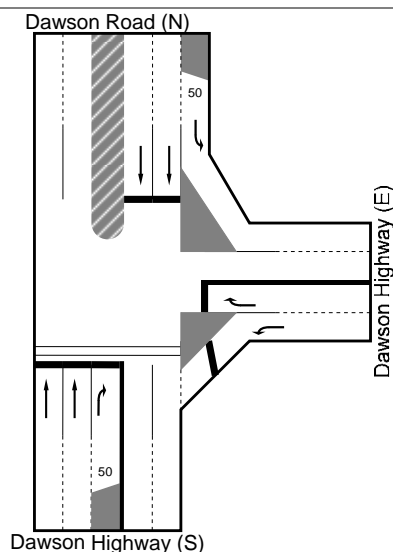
Existing Dawson Highway/Dawson Road/Breslin Street intersection
